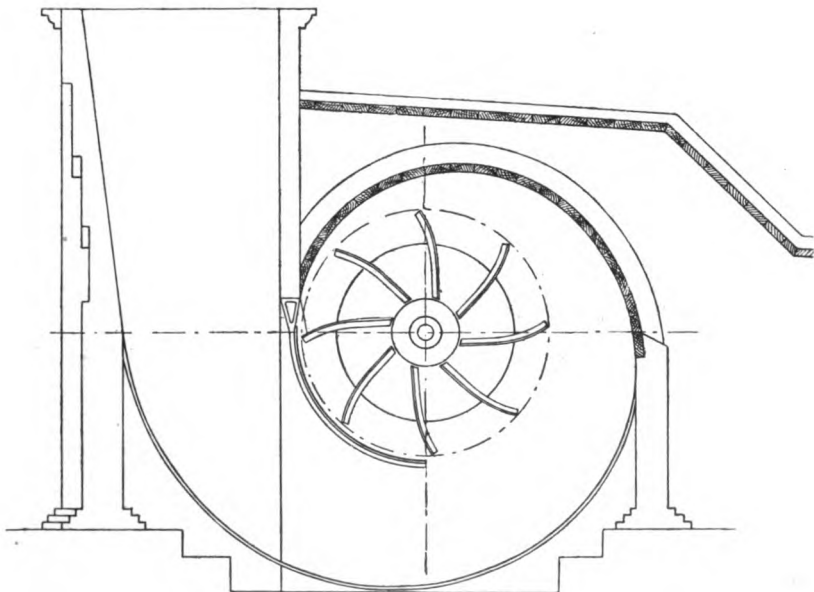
Vertical Section showing Walker Fan and Fan-casing.
